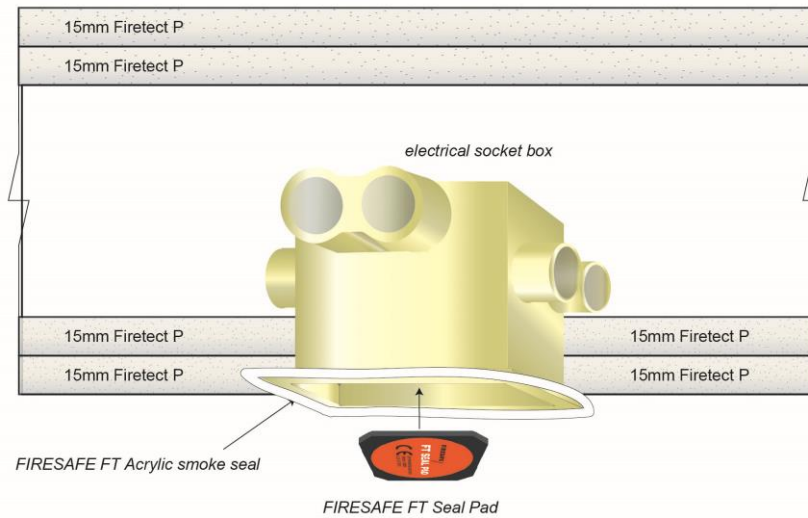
Single electrical ceiling box in flexible ceiling – sectional views
